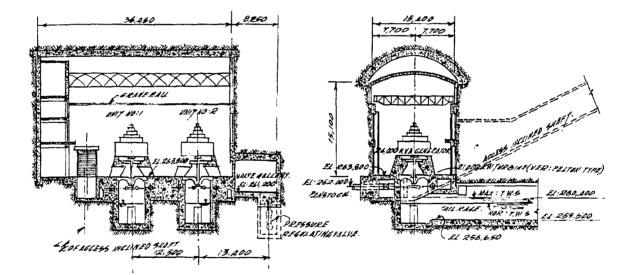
(t) LONGITUDINAL AND CROSS SECTIONS OF NO: 1 POWER HOUSE.
